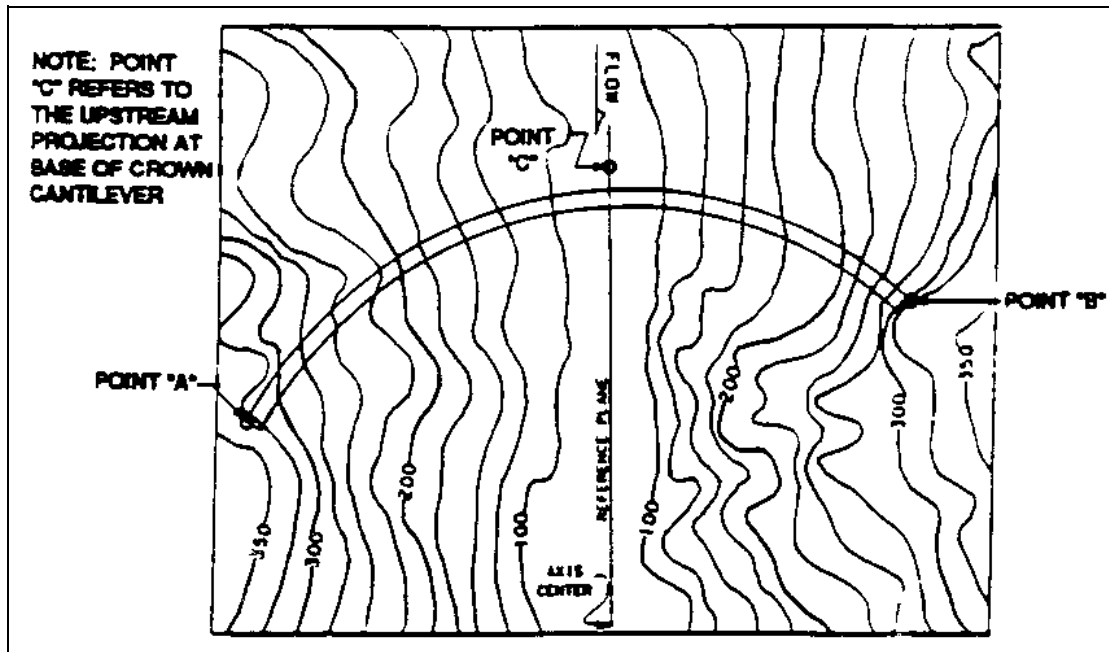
Contact points between dam and foundation at crest and crown cantilever
